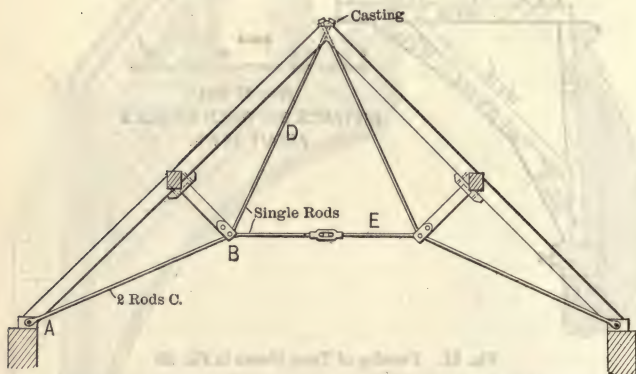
Wooden Truss with Iron Ties. Spans up to Thirty-six Feet
